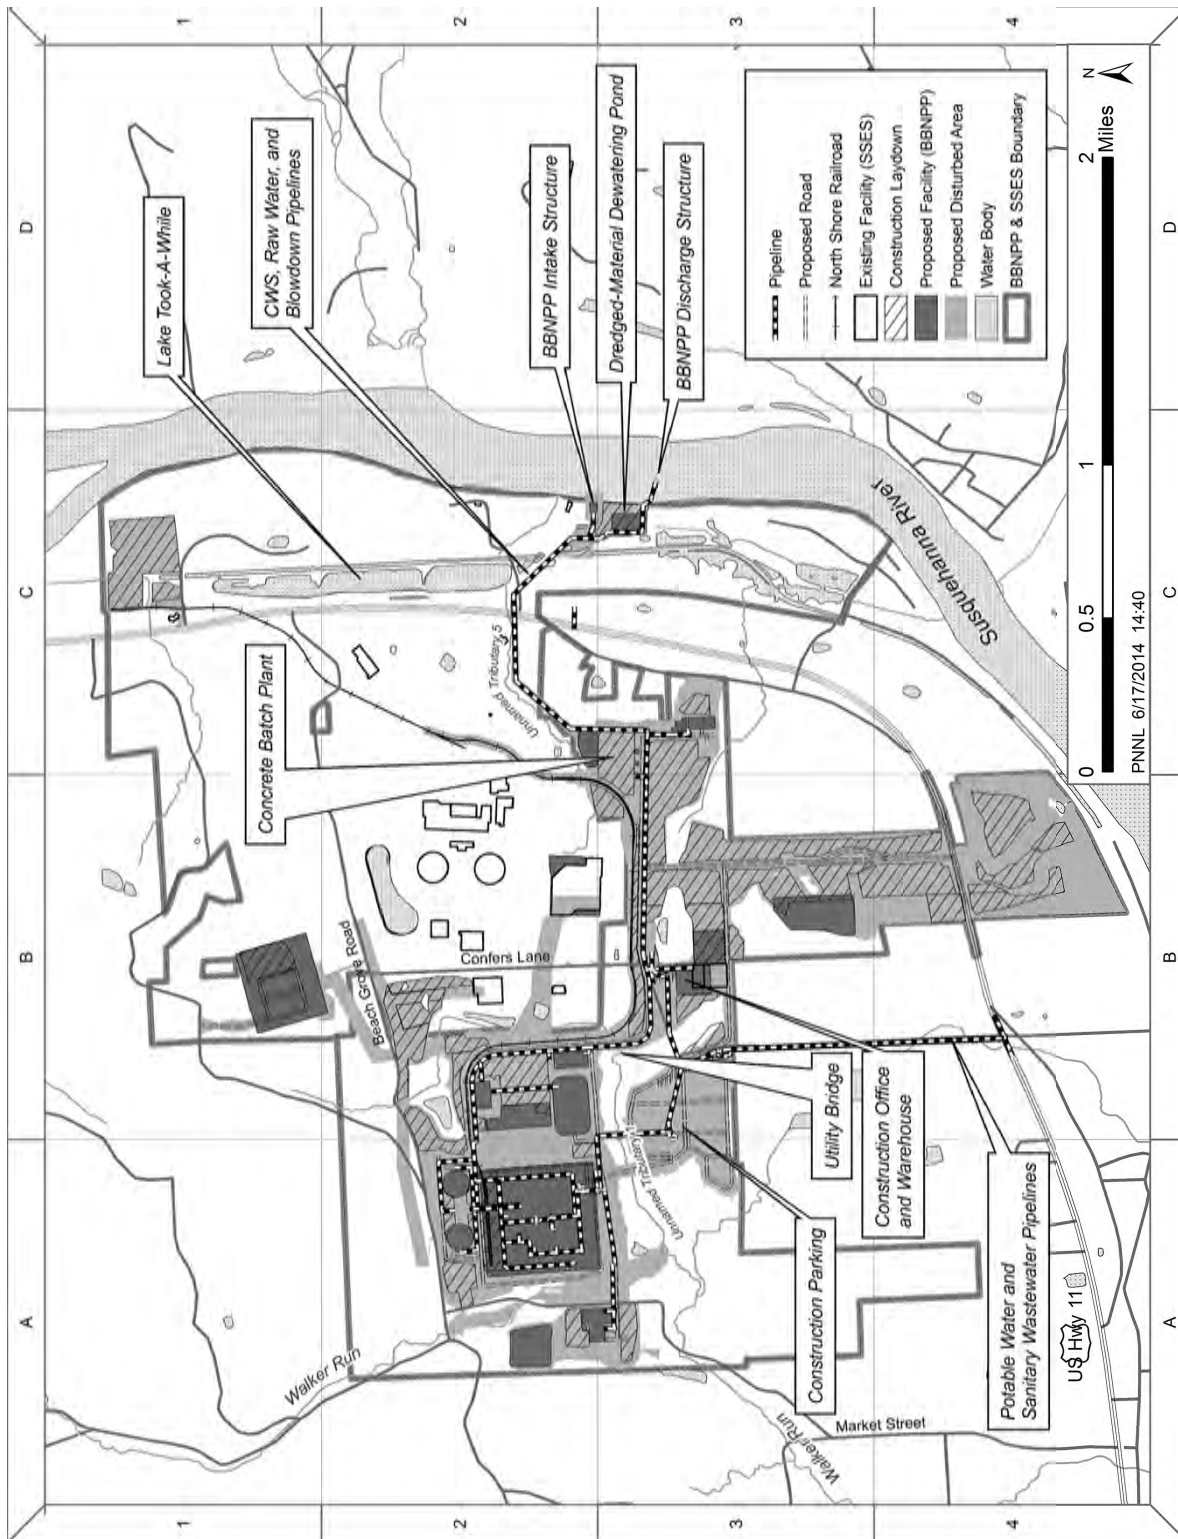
Proposed BBNPP Project Area Utilization during Construction and Preconstruction
